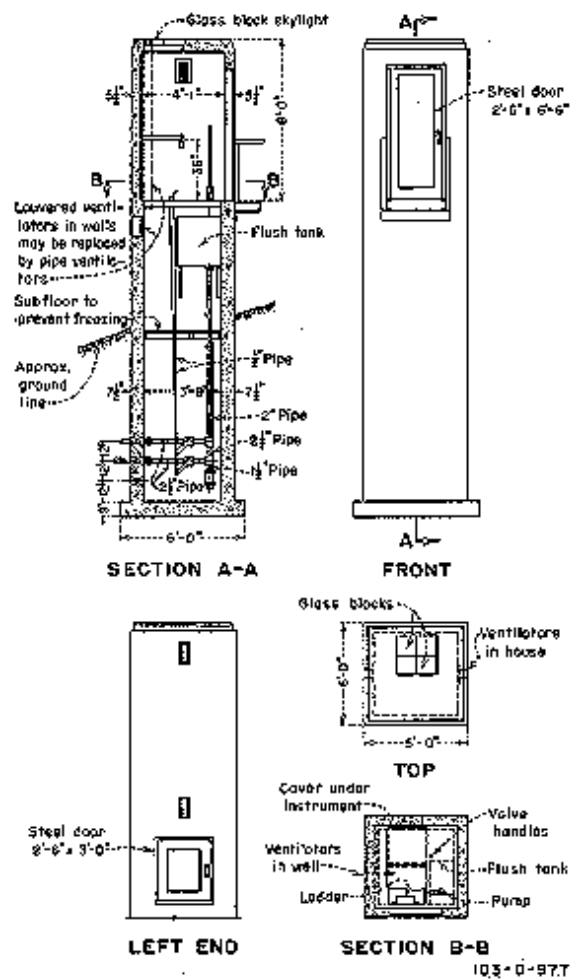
Plans for reinforced concrete recorder house and stilling well.
